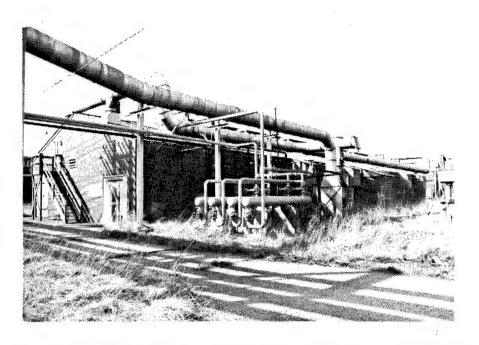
Building 208-9: Mixer House, representing one of two construction designs.
